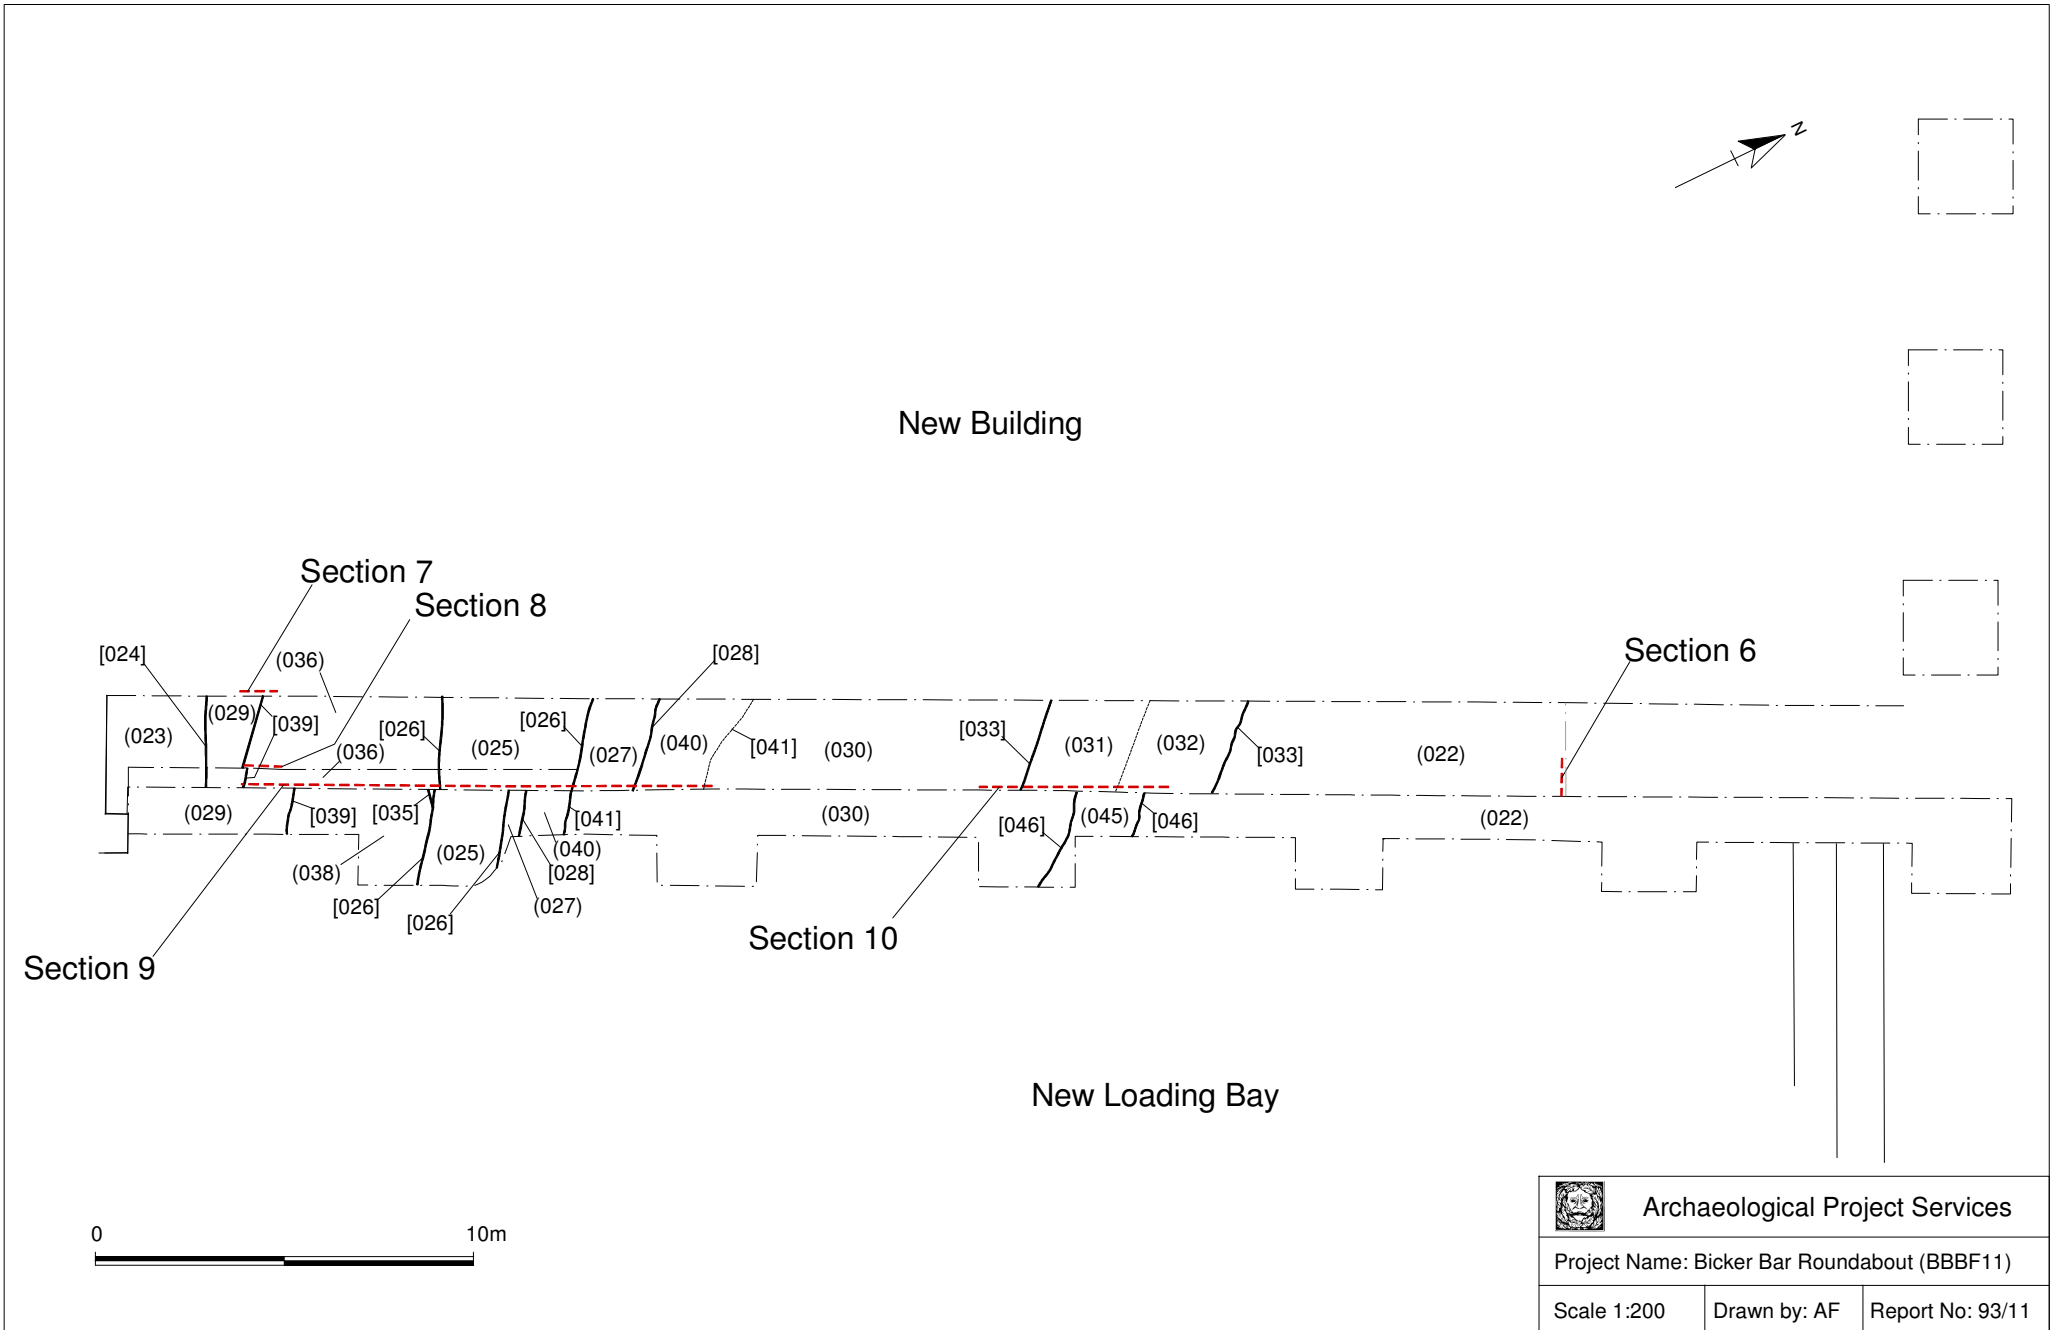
Foundation trench for new building showing locations of Sections 6-10
